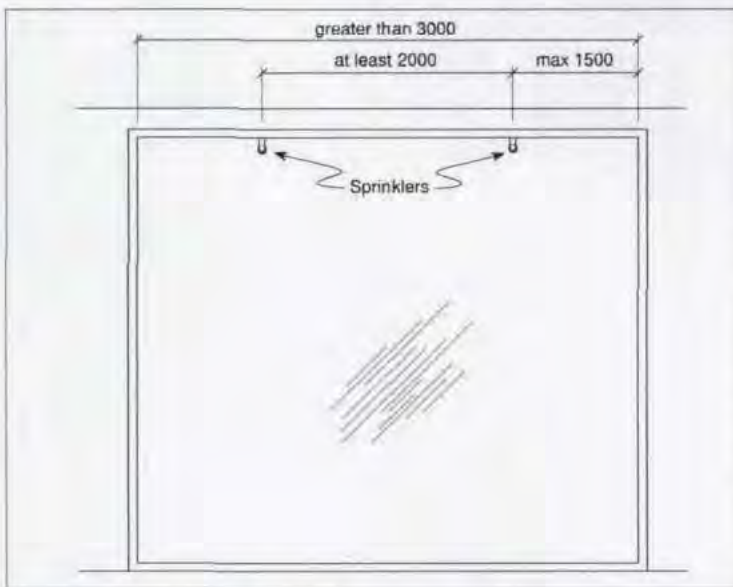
Location of sprinklers in multi-sprinkler system for protection of wide windows (elevation)
